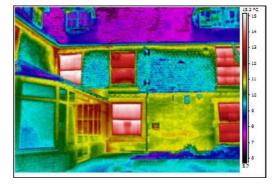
East elevation showing heat loss through the external wall at ground floor which is potentially due to poor insulation of the external wall
